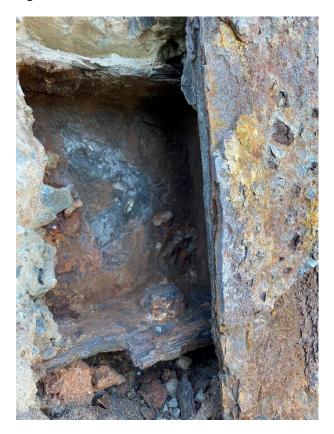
Crosby Street Column flange with severe section loss and de-lamination of incoming steel beam.
